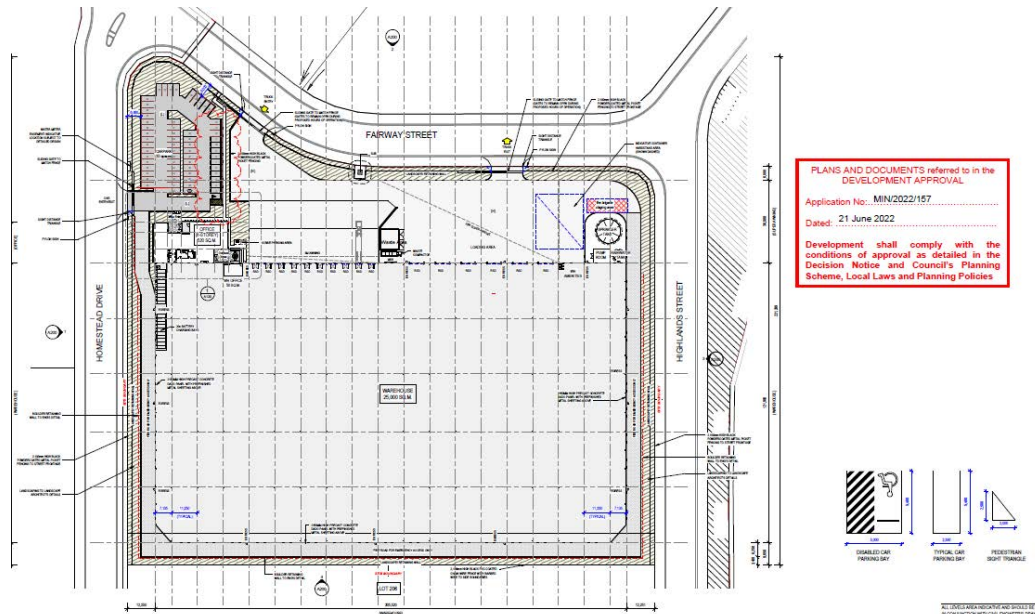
Approved development layout on future Lot 205 – MIN/2022/157 (GDP file, 2024)
